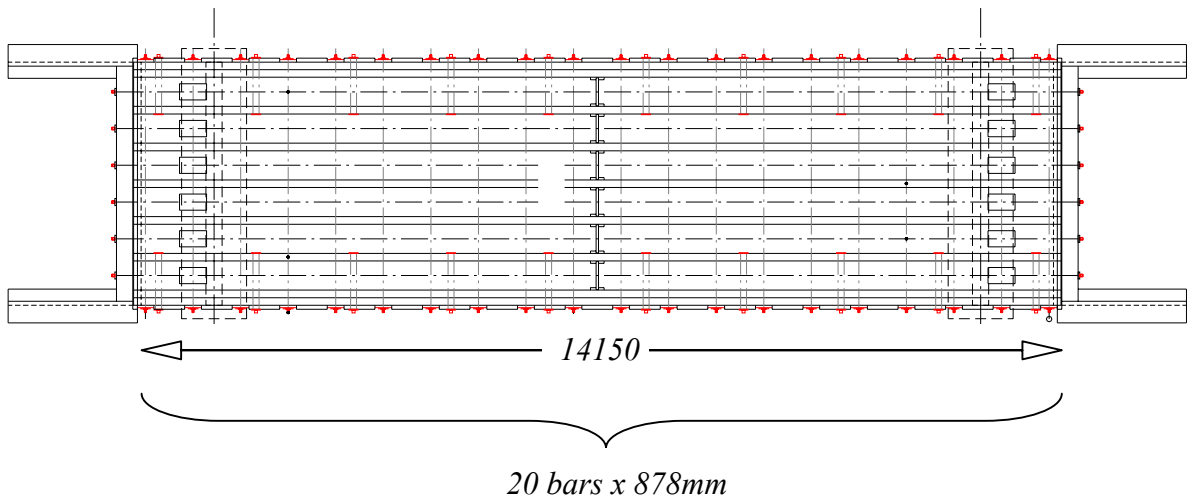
Distance between prestressed bars for a single span Box-beam bridge. (Moelven Töreboda)
